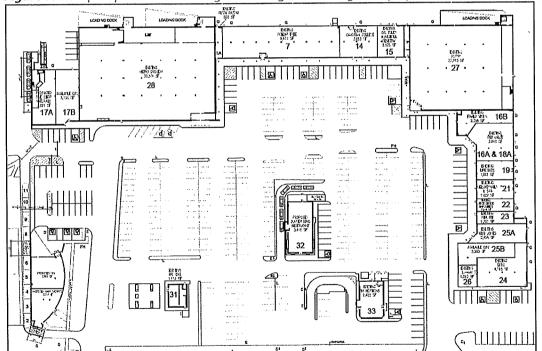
Excerpt of plan demonstrating the existing drive-through and proposed fourth drive-through.
